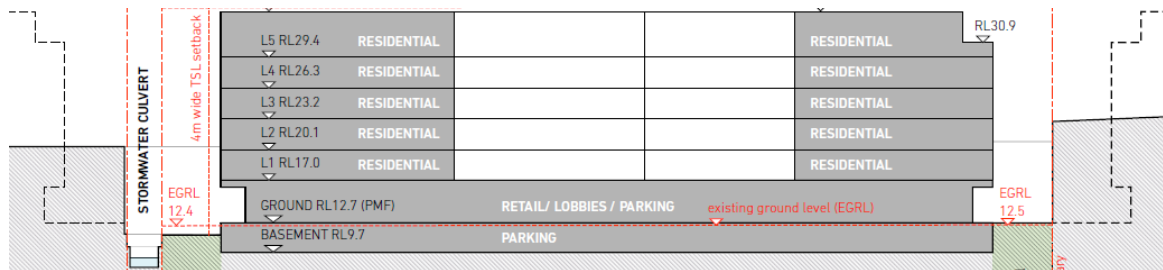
A section through the proposal which indicates the potential development of neighbouring properties (indicated by a dotted line).
